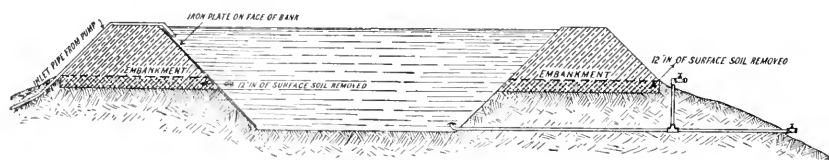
Section of reservoir showing formation of embankments, position of inlet pipe connexion with the dam, outlet pipes, &c.
